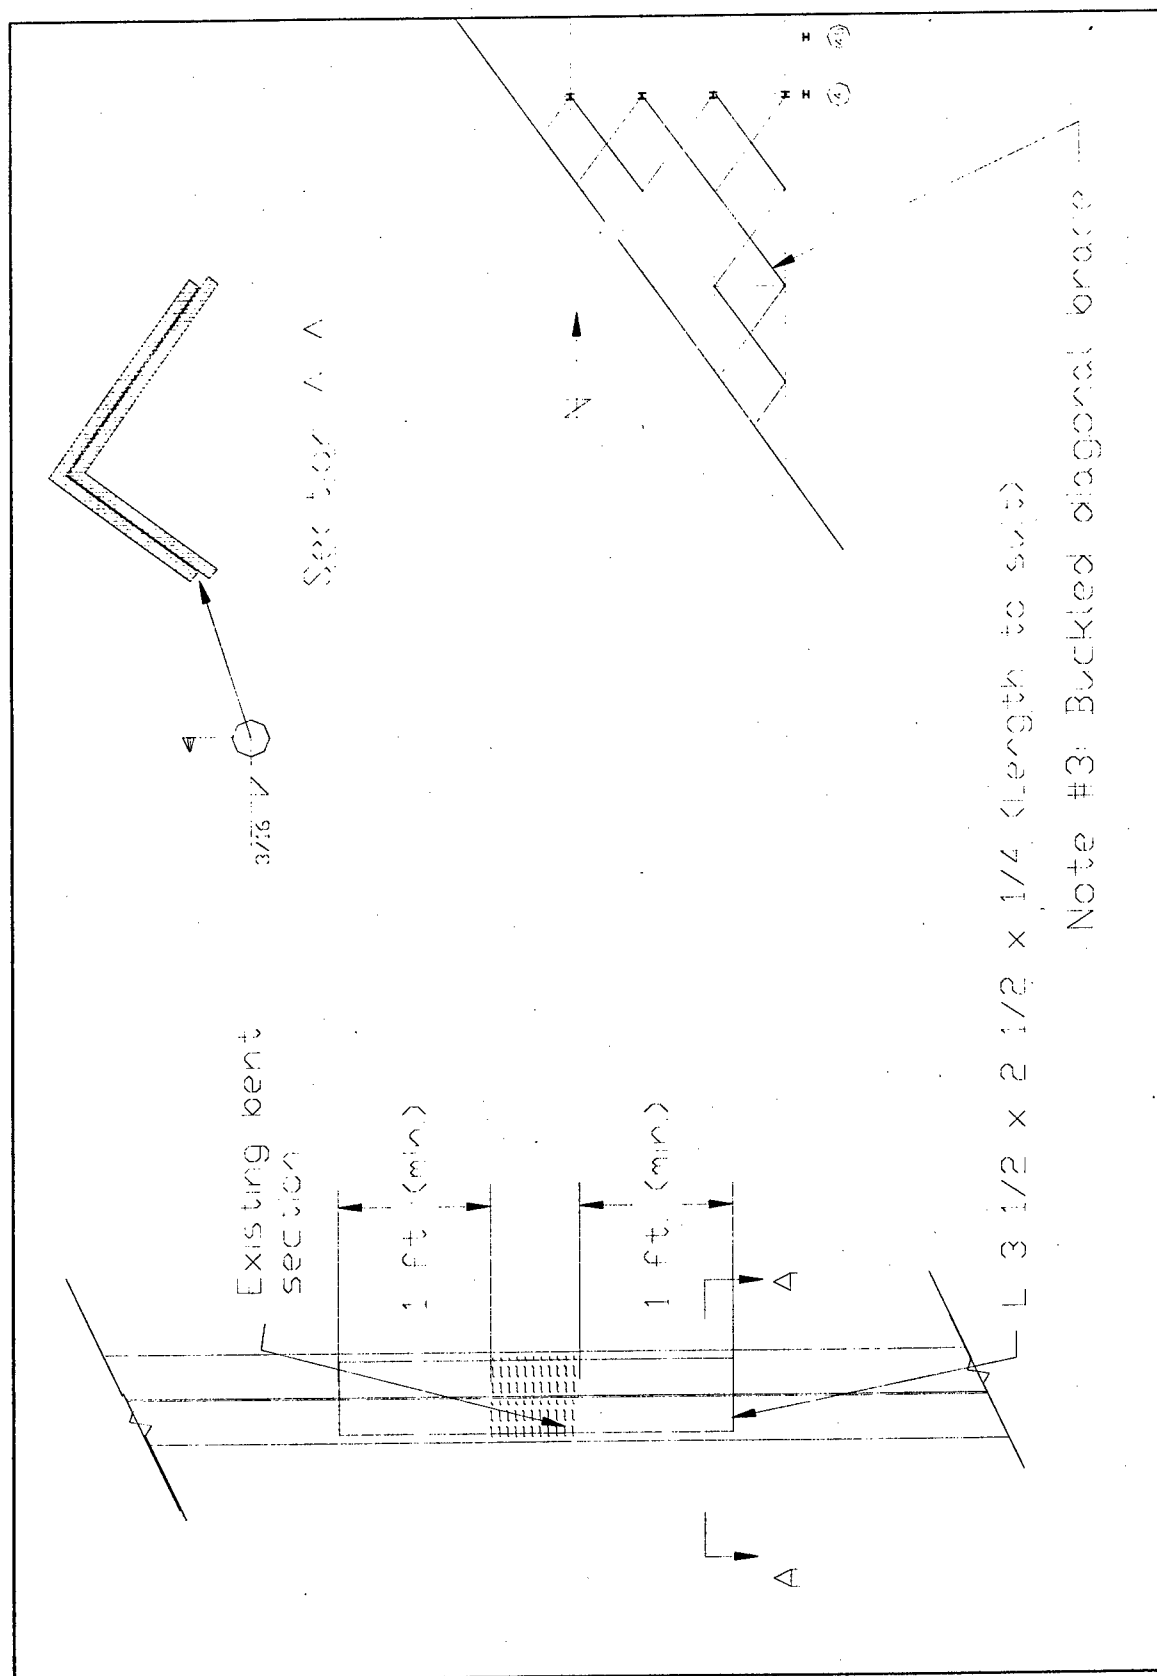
CCAD, TX, repair of bent horizontal bracing member.
